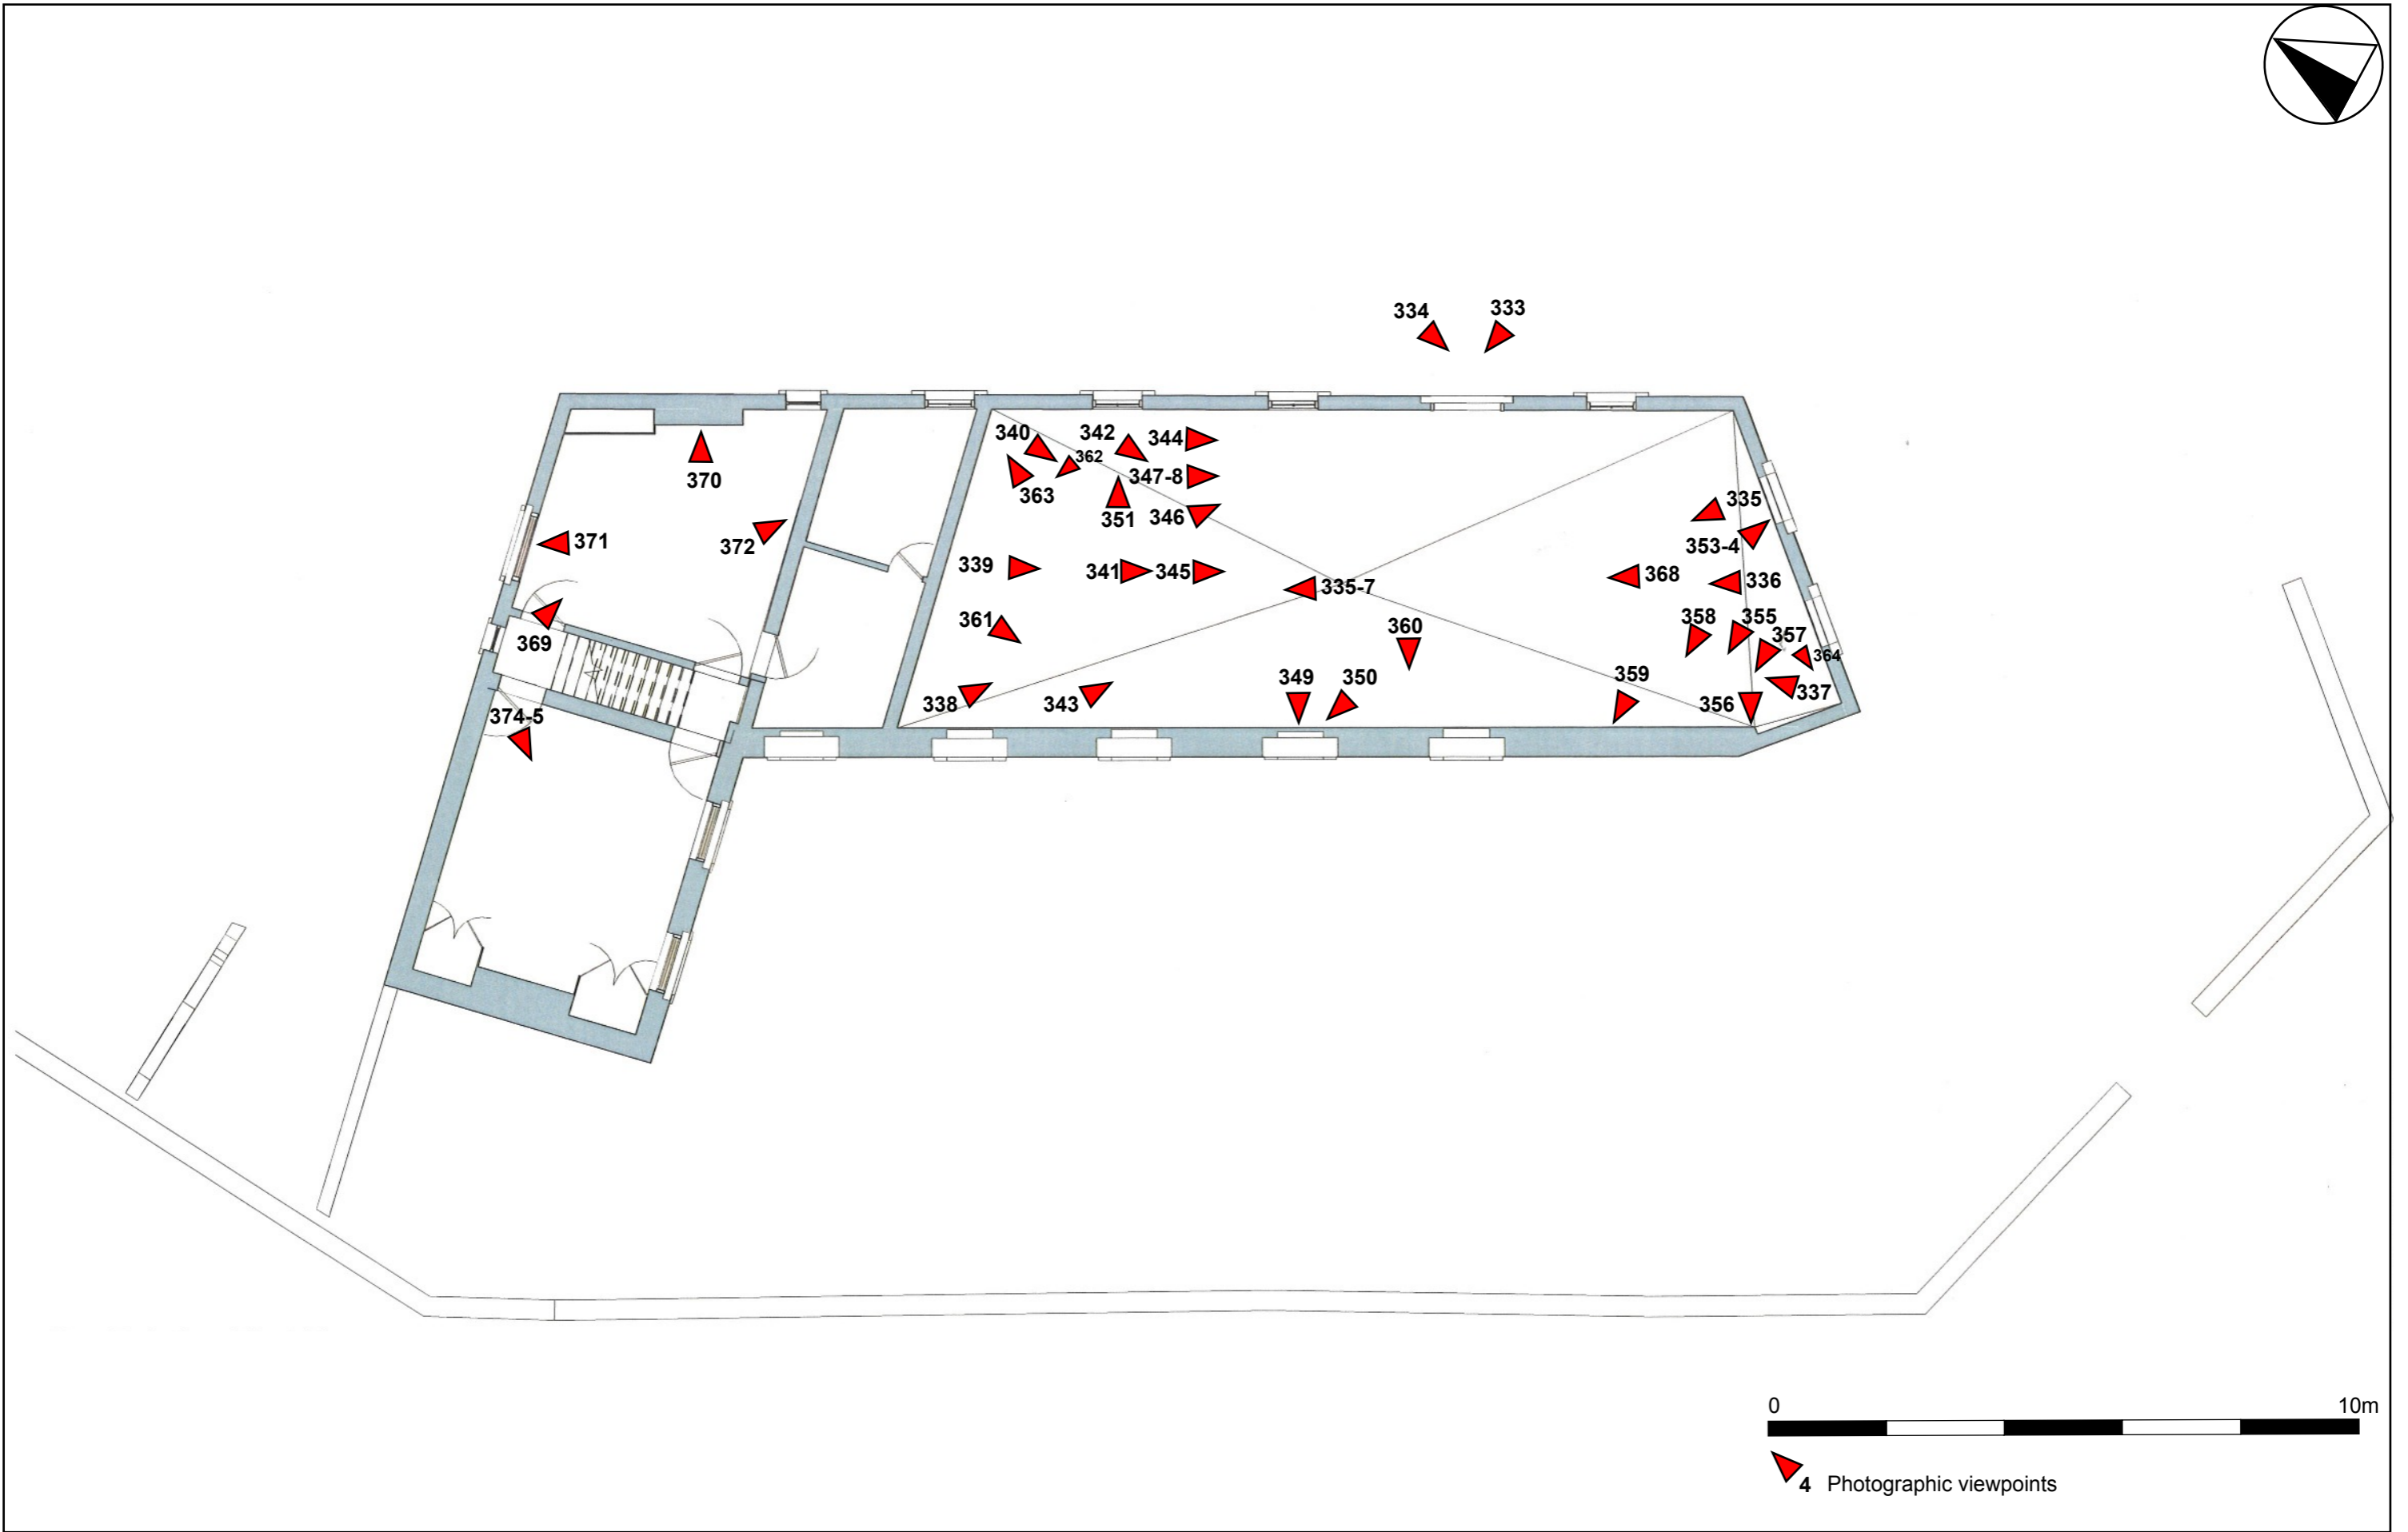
Plan of the ground floor of the west wing and house with the photographic viewpoints indicated, based on a drawing provided by the client.
